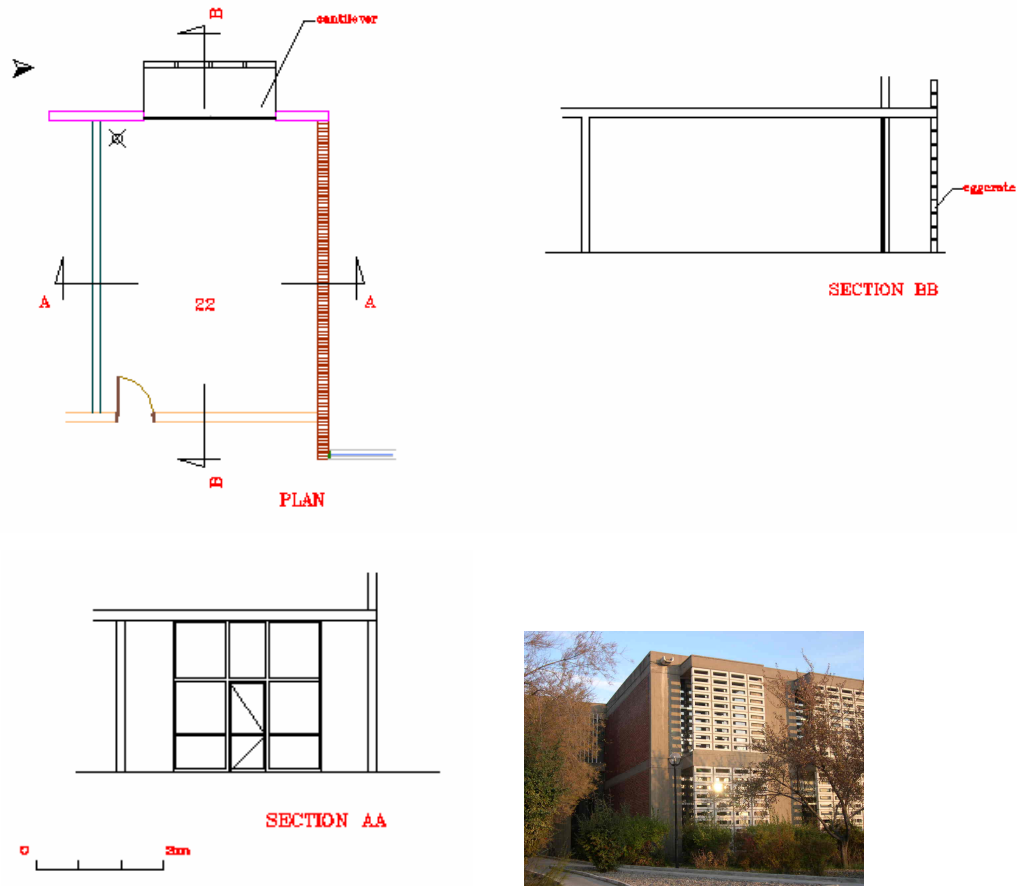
Floor plan, section AA, section BB and exterior view of Room 22.
